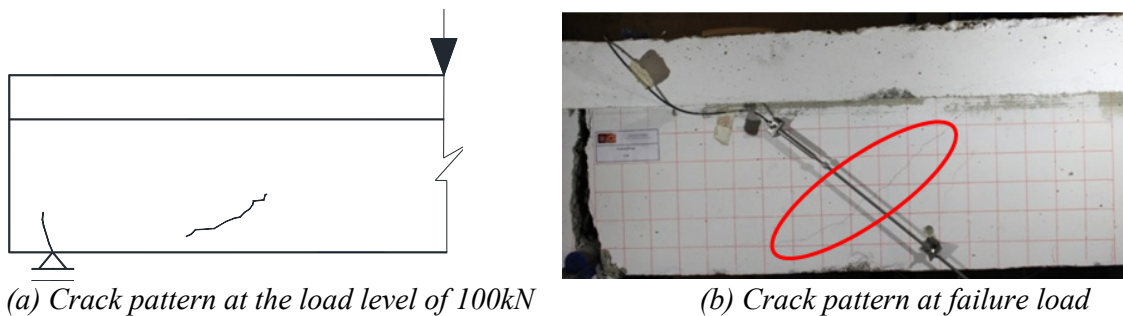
Crack patterns and failure modes of the C-R-II beam
